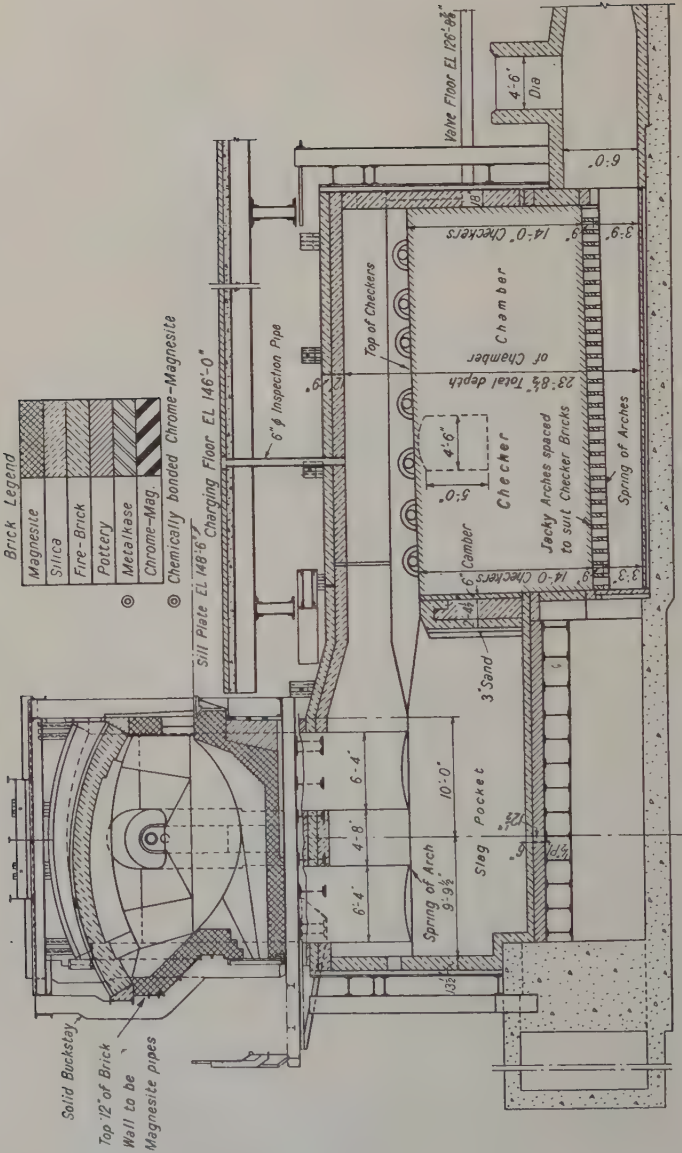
240-Ton Furnace. Sections on centre-lines of the furnace and of the slag pocket and checker chamber.
